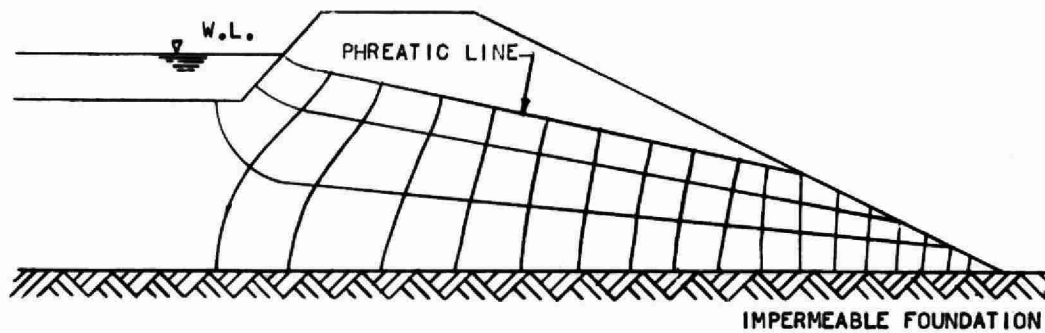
FLOW NET FOR A SLIMES DAM WITH AN IMPERMEABLE FOUNDATION
